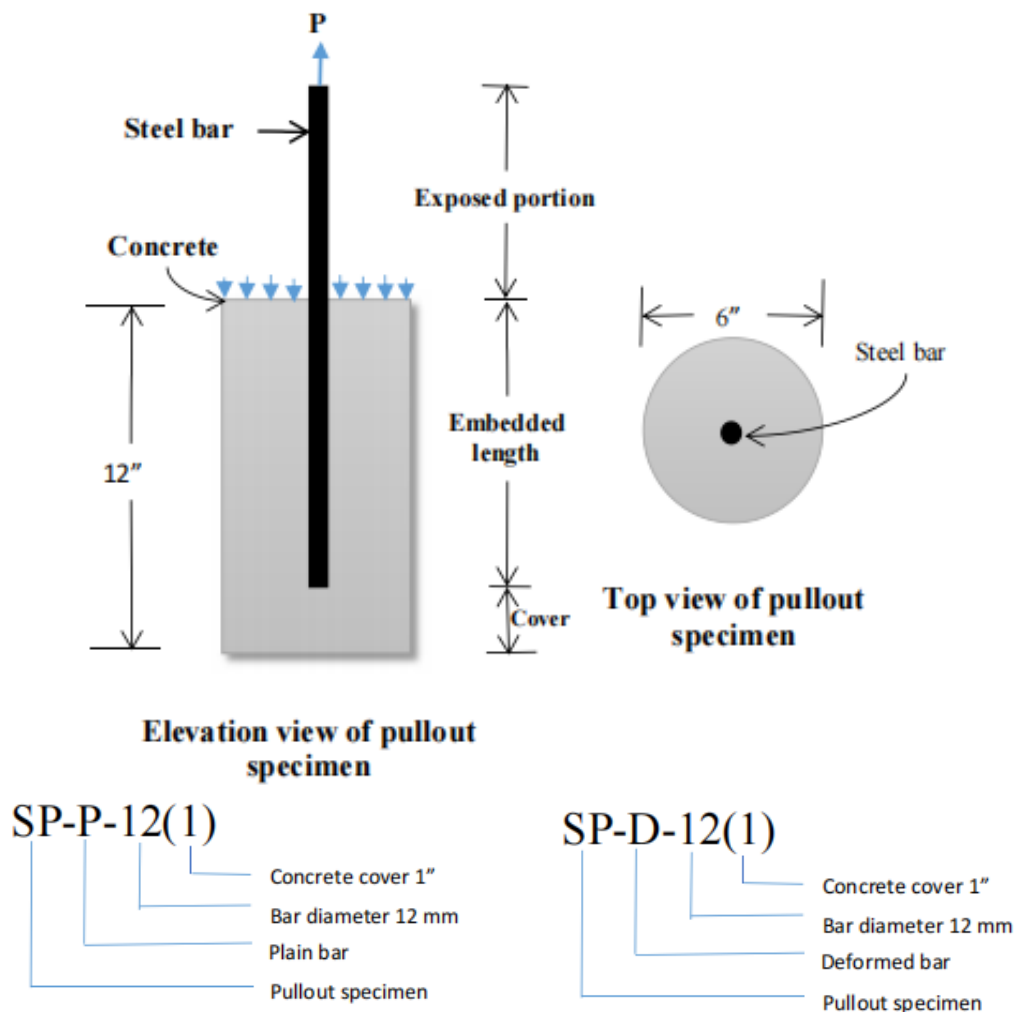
Pullout specimen details and concrete cylinder specimen designation.
